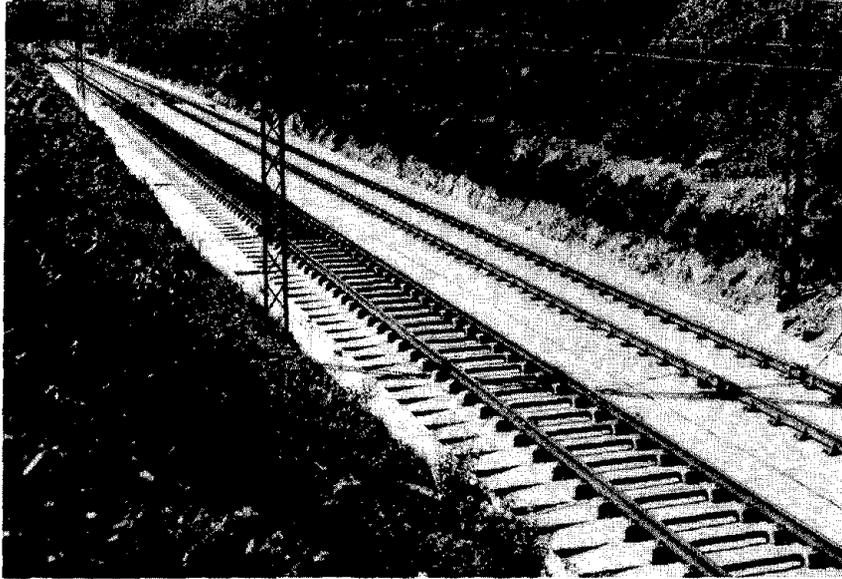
SLAB TRACKS AT LA GRILLERE
